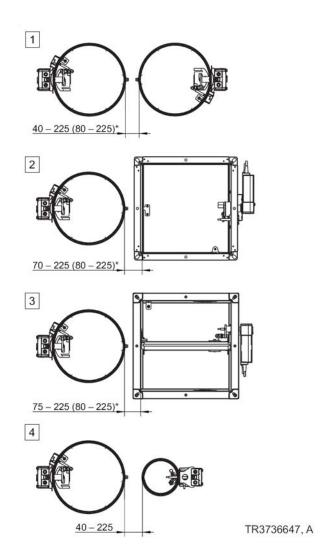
Distance from the FKR-EU to other TROX fire dampers in mortar-based installation
